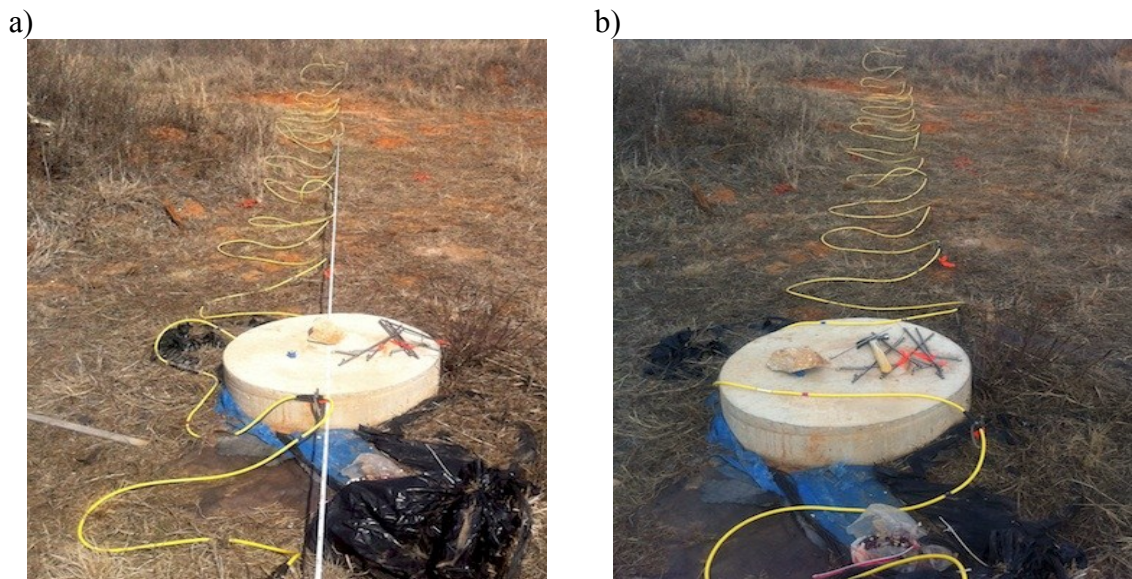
Views of profiles UK1A (a) and UK1B (b) carried out over an unknown foundation drilled shaft.
